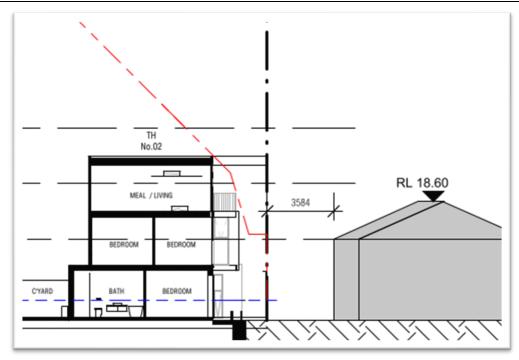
Setback of north-facing windows within No. 7 Fraser Street
